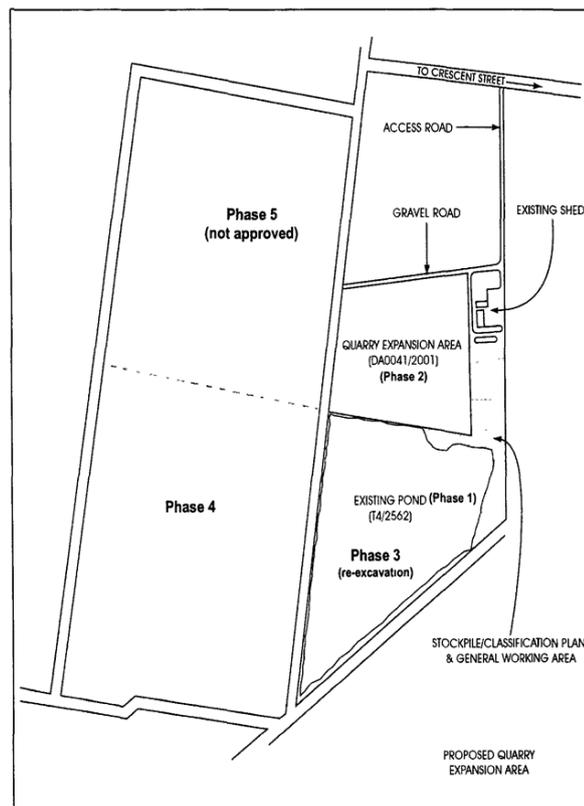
Approved Sand Quarry Layout under DA 152-6-2005
